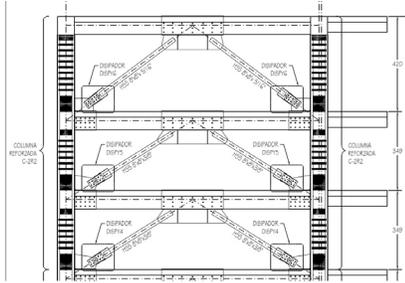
Typical arrangement of YRB proposal in the short sense (Y) (left)
